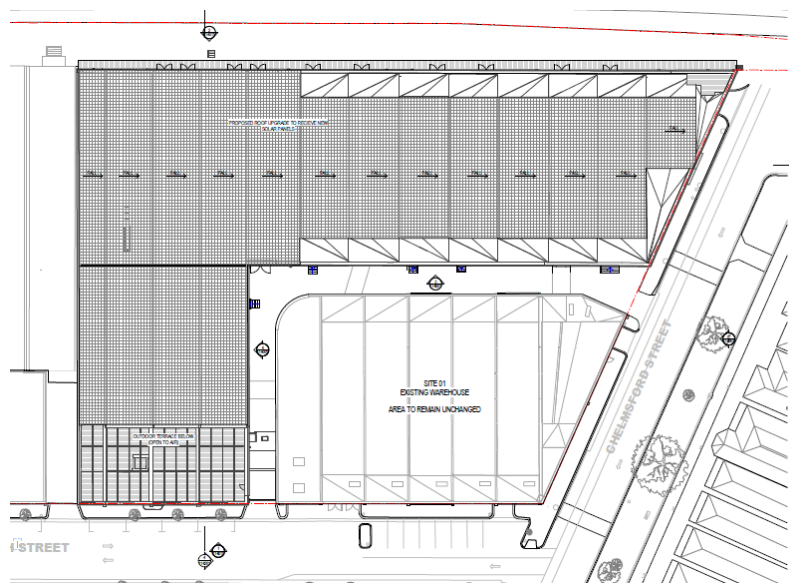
, extract from Woods Bagot TP drawing set showing proposed roof plan.
